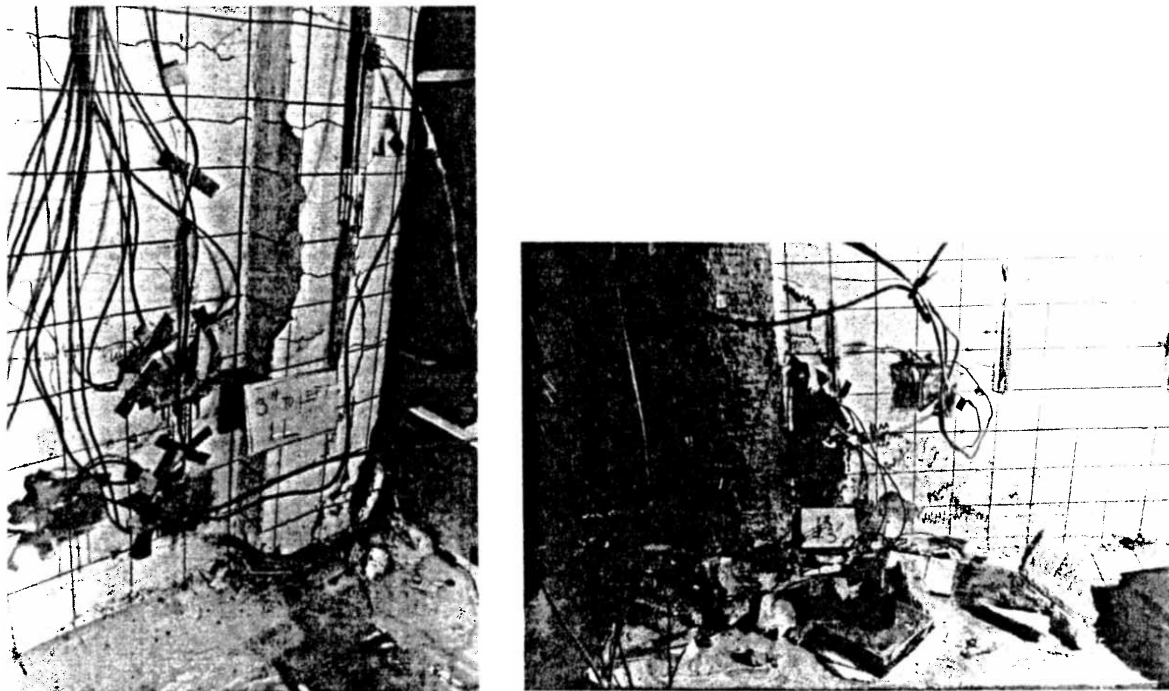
Damage to 1C at web crushing of left wall pier (-1.3% drift) (Ozselcuk, 1989)
